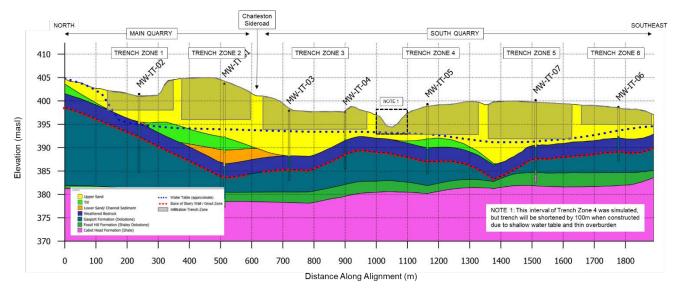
Proposed Groundwater Mitigation System consisting of six Infiltration Trench Zones and two Hydraulic Barrier Zones
